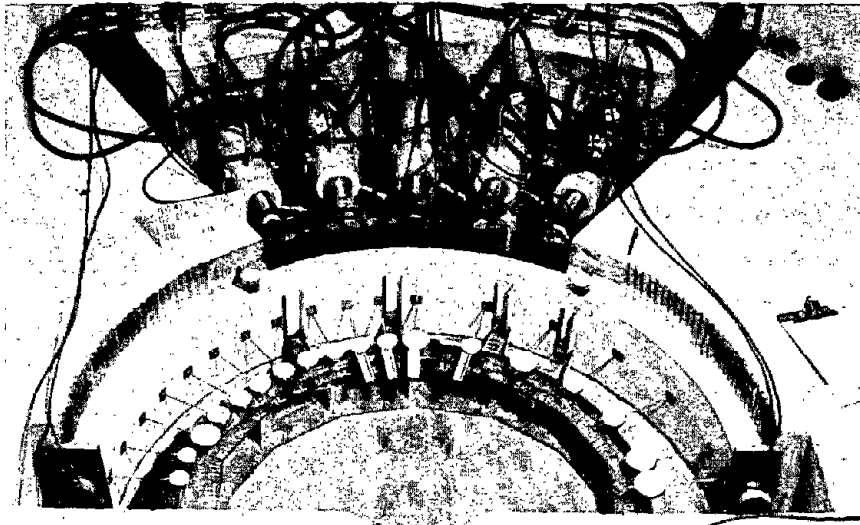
DIAL GAGES IN PLACE ON A SPECIMEN
